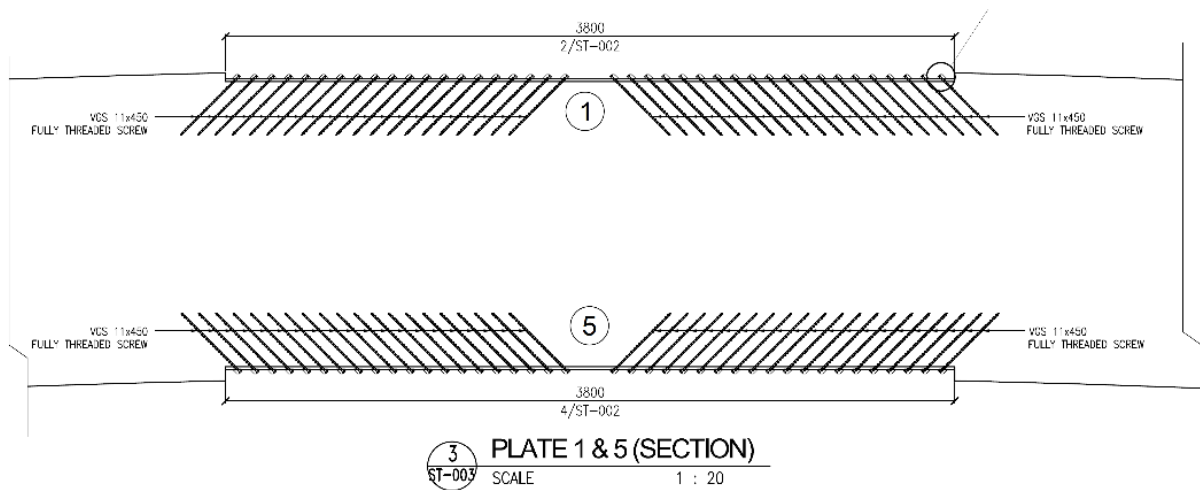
Moment resisting connection with steel plates and fully threaded screws.
